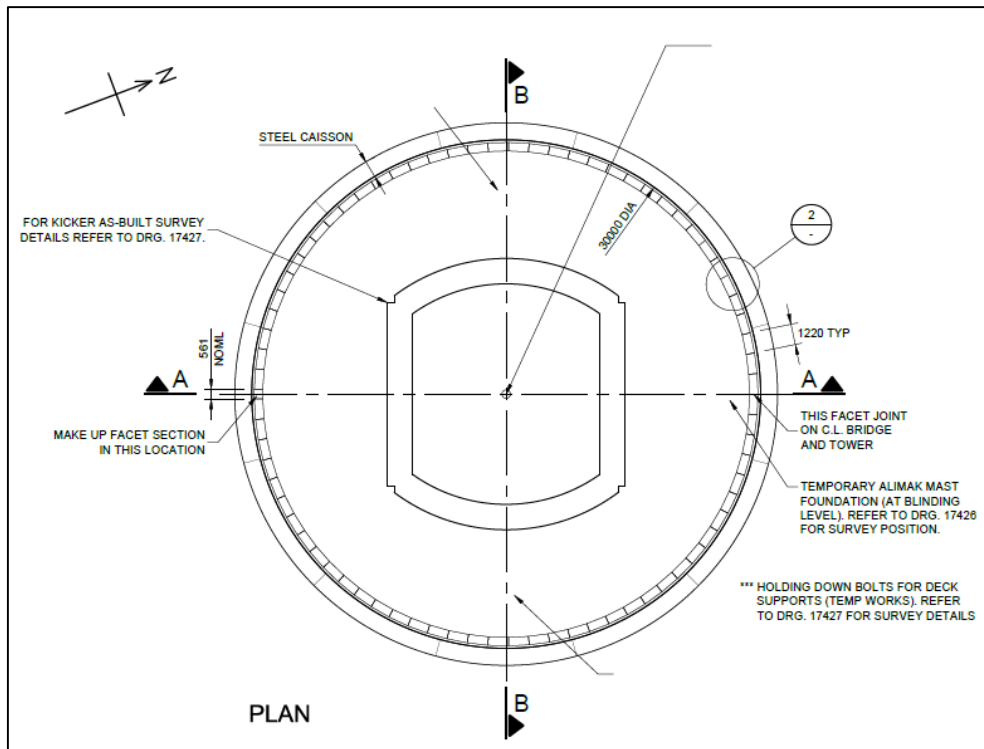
South Tower foundation, Plan (Ramboll ii, 2015)
